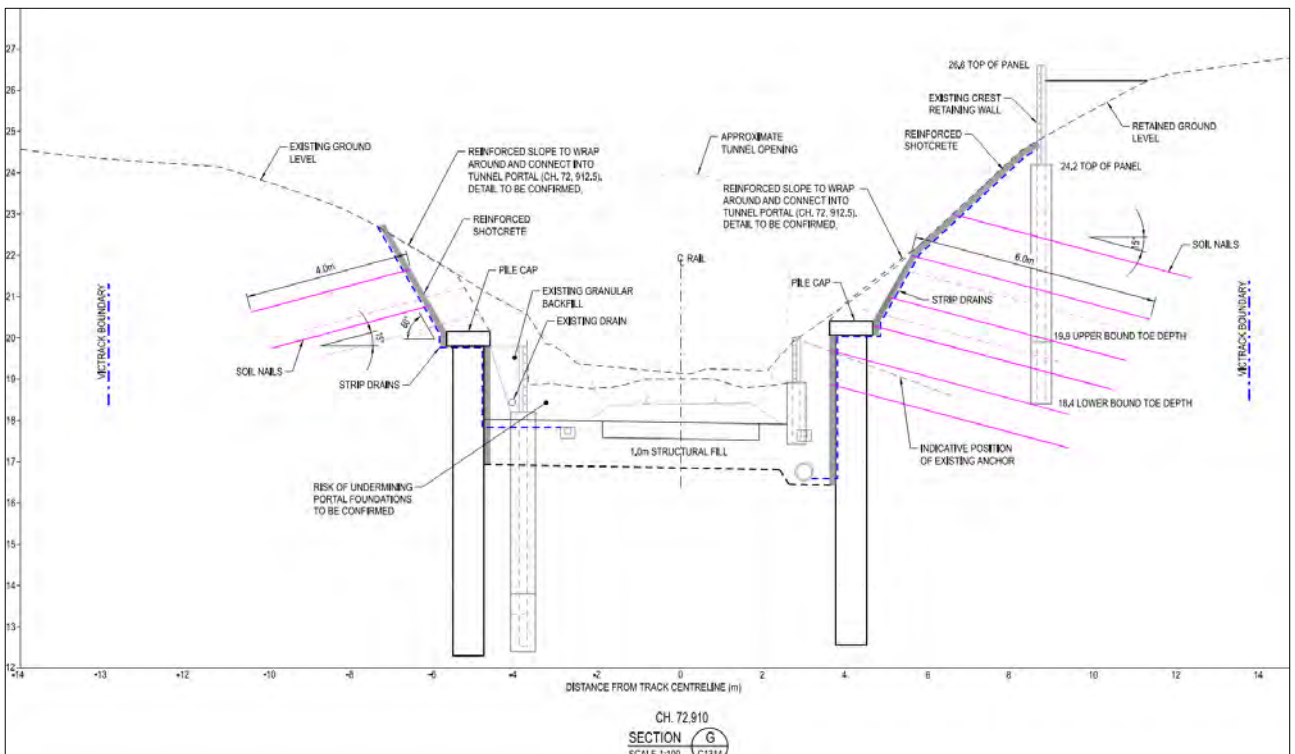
TYPICAL SECTION AT CH. 72.910 SHOWING RETAINING WORKS ON APPROCHES AT UP-END PORTAL (SOURCE: AURECON/VLINE)
